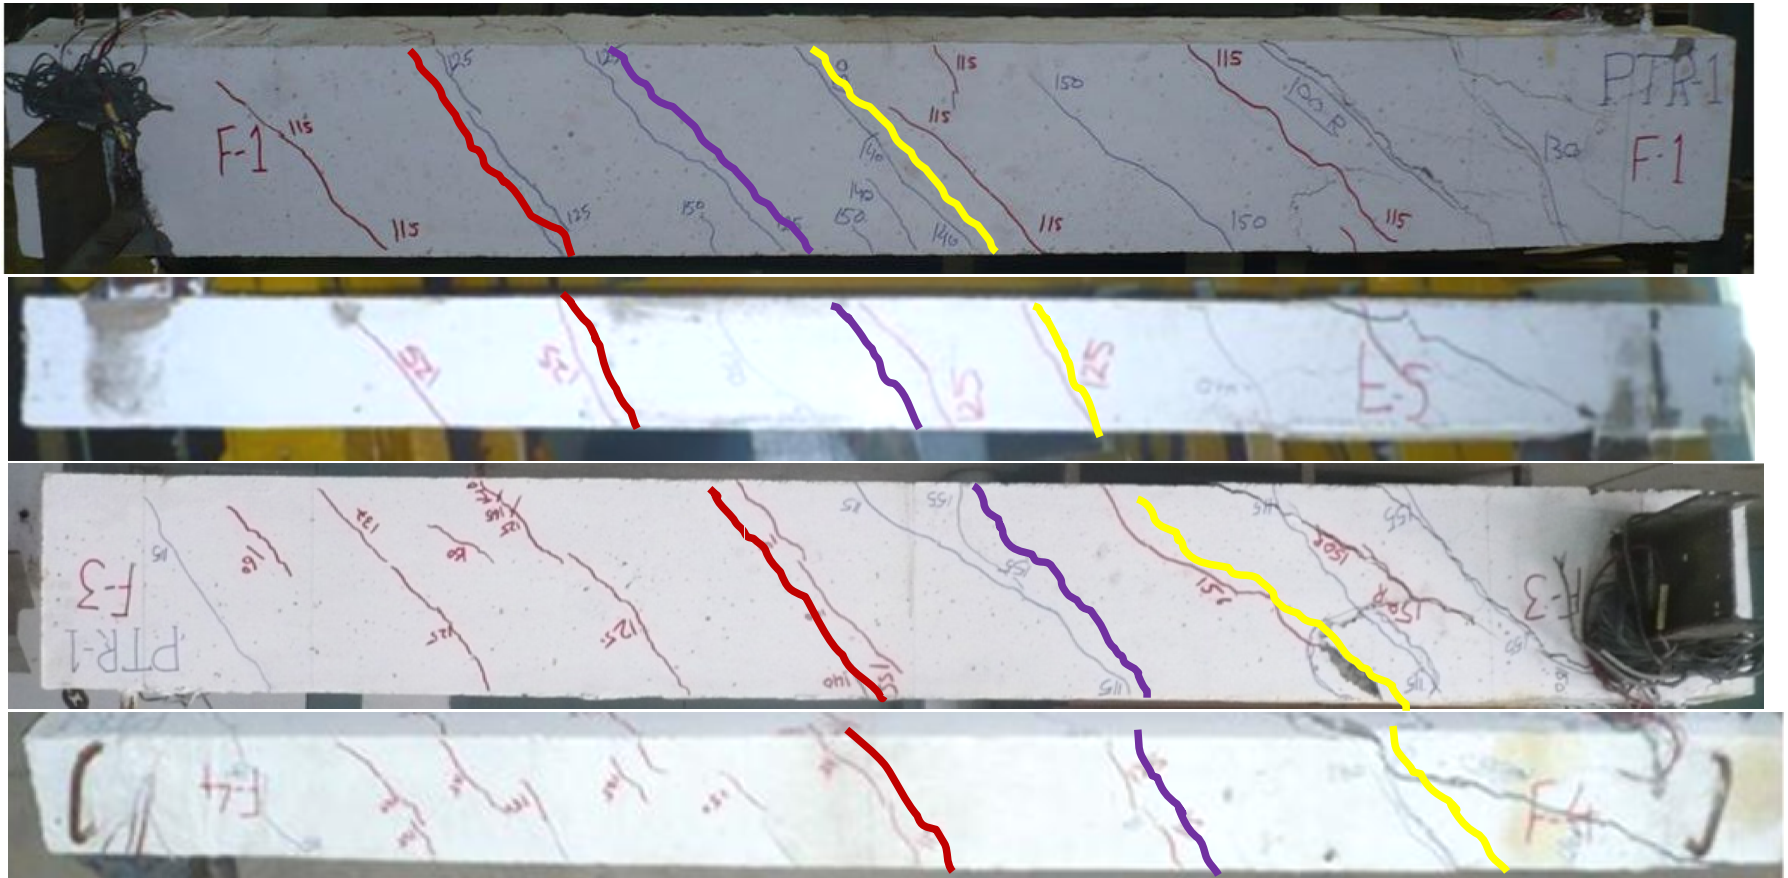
Typical Crack Pattern of PTR-1 at failure (All Four Faces in One Plane under Pure Torsion)
